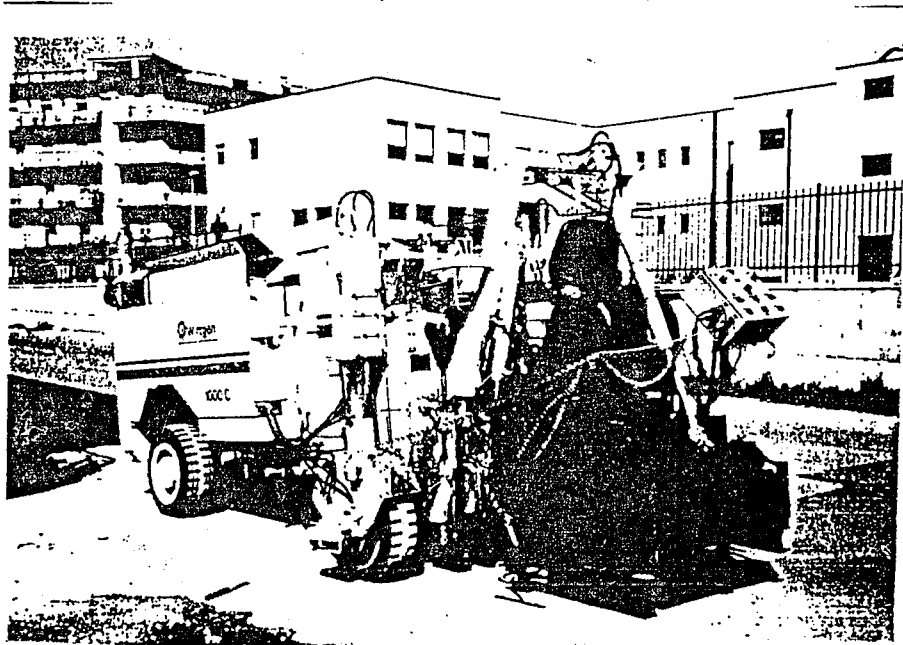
The 1000 CR Cold Recycling Machine
